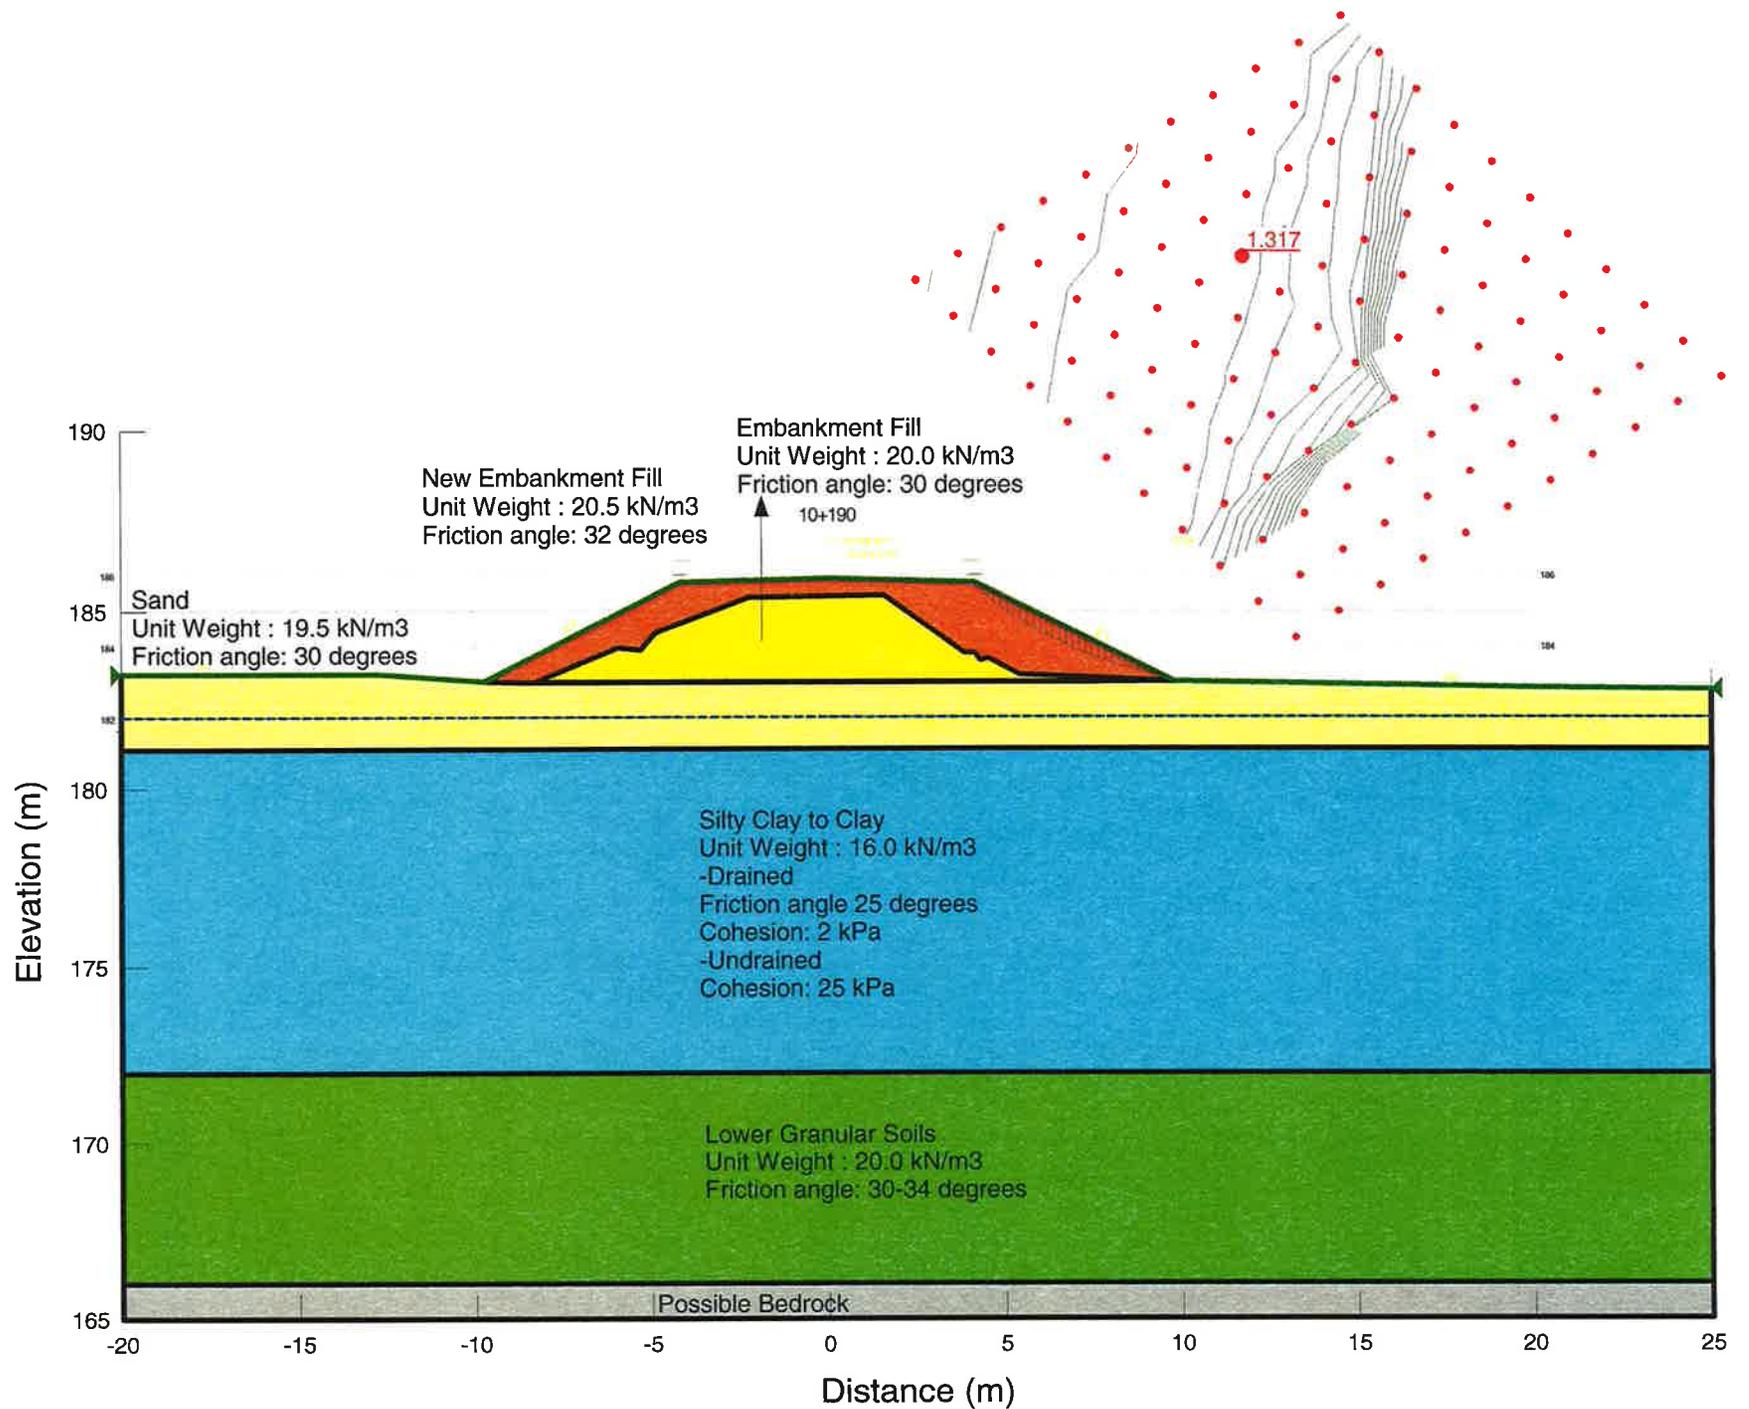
Stability analysis @ STA. 10+190 (north abutment location) for concrete bridge option
